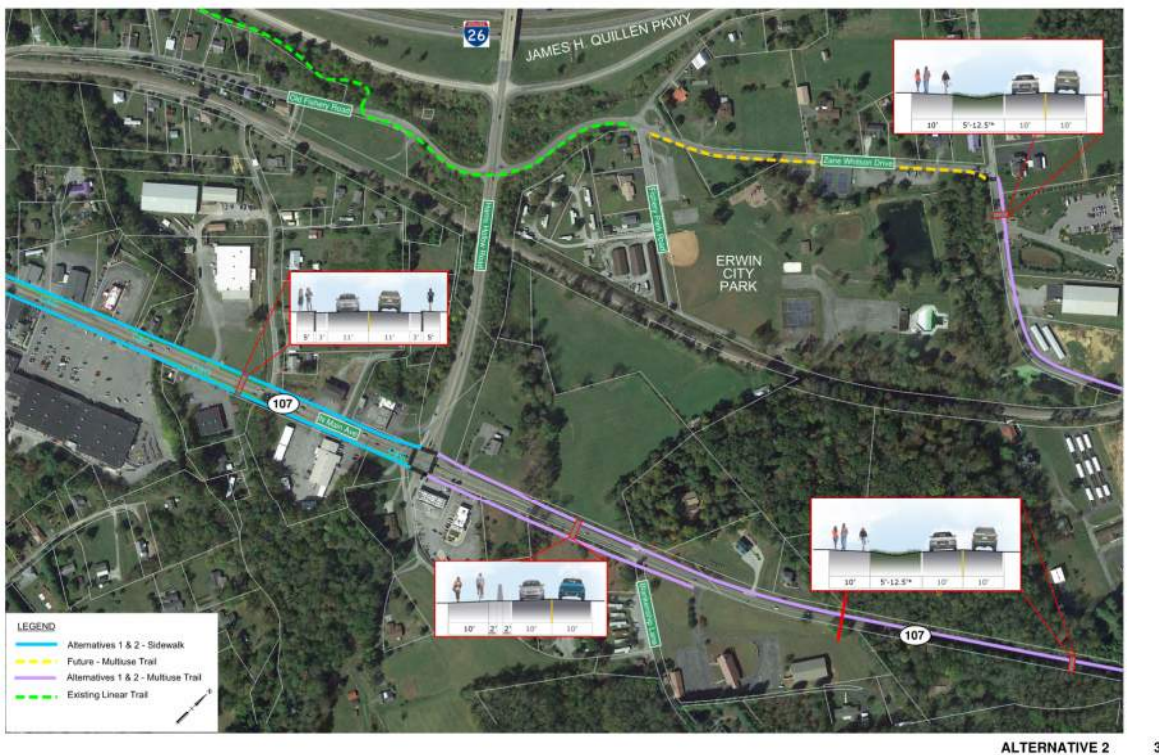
Erwin and Unicoi Recommended Alternatives 2 – Plan Sheets Page 4
